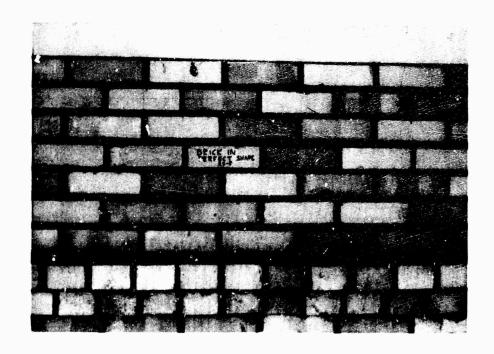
2S-5, Fireplace Masonry in Perfect Condition
